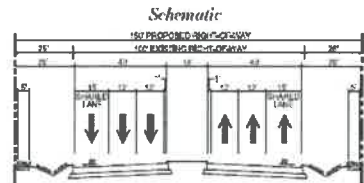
TxDOT Schematic Typical Right-of-Way Cross Section
